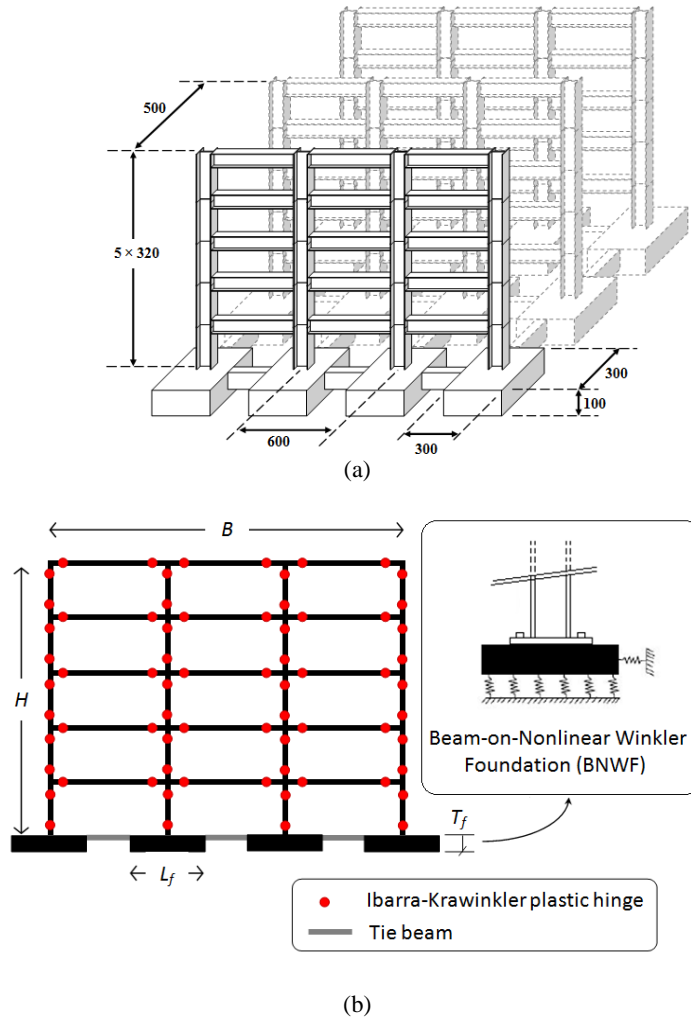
a) 3D view of the primary building-foundation system; b) Soil-foundation-structure model
